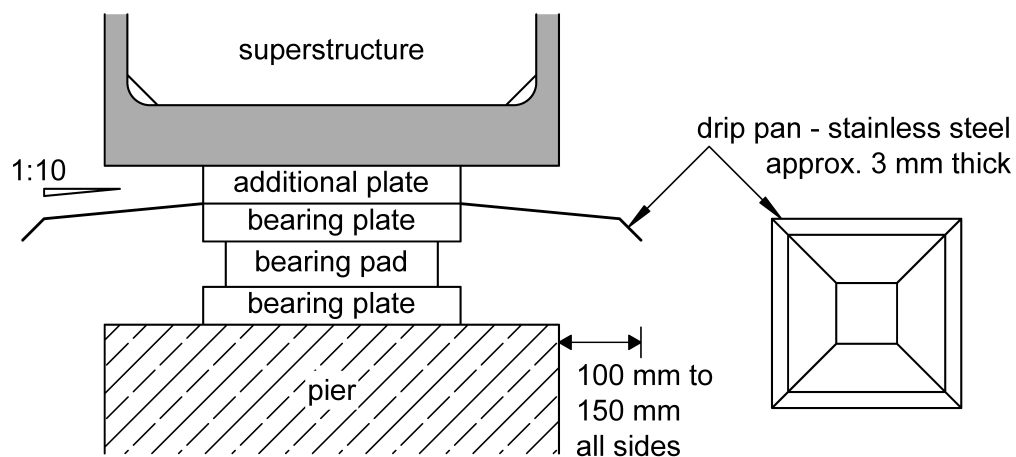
Principle sketch for the design of a drip pan to protect piers from staining
